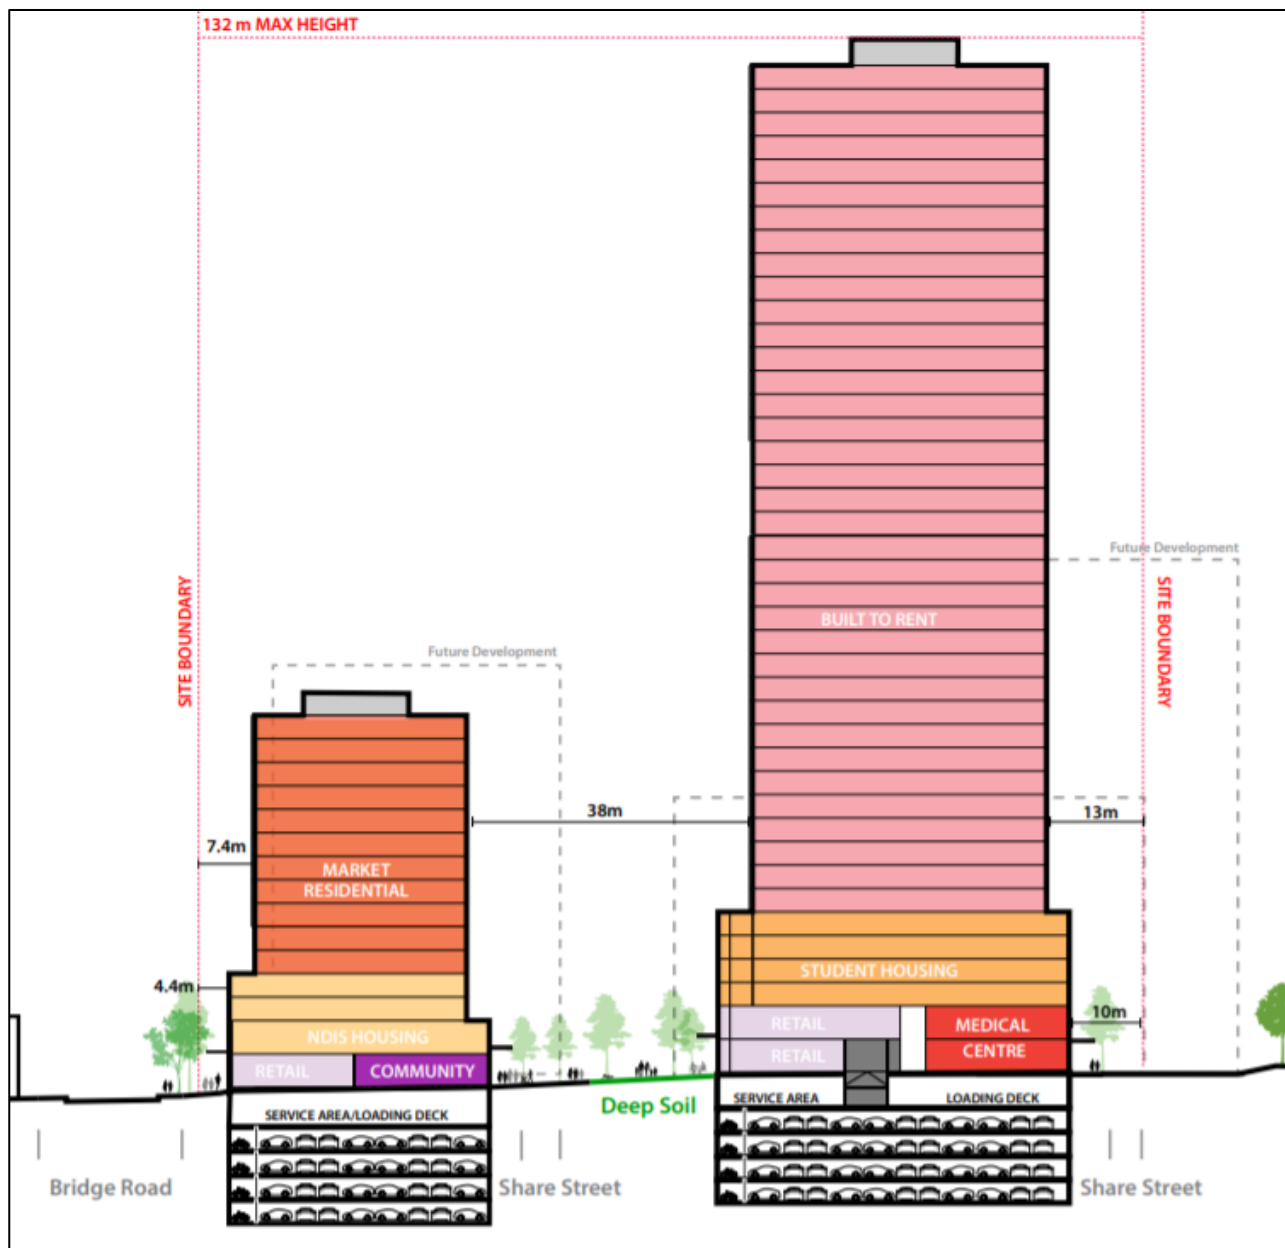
Added Value Height of Buildings for 93 Bridge Road, Westmead (Roberts Day 2020)
